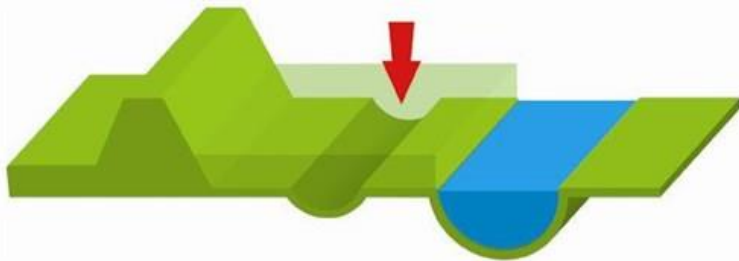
Side channel or excavation of floodplains (Ruimte voor de Rivier, 2014)
